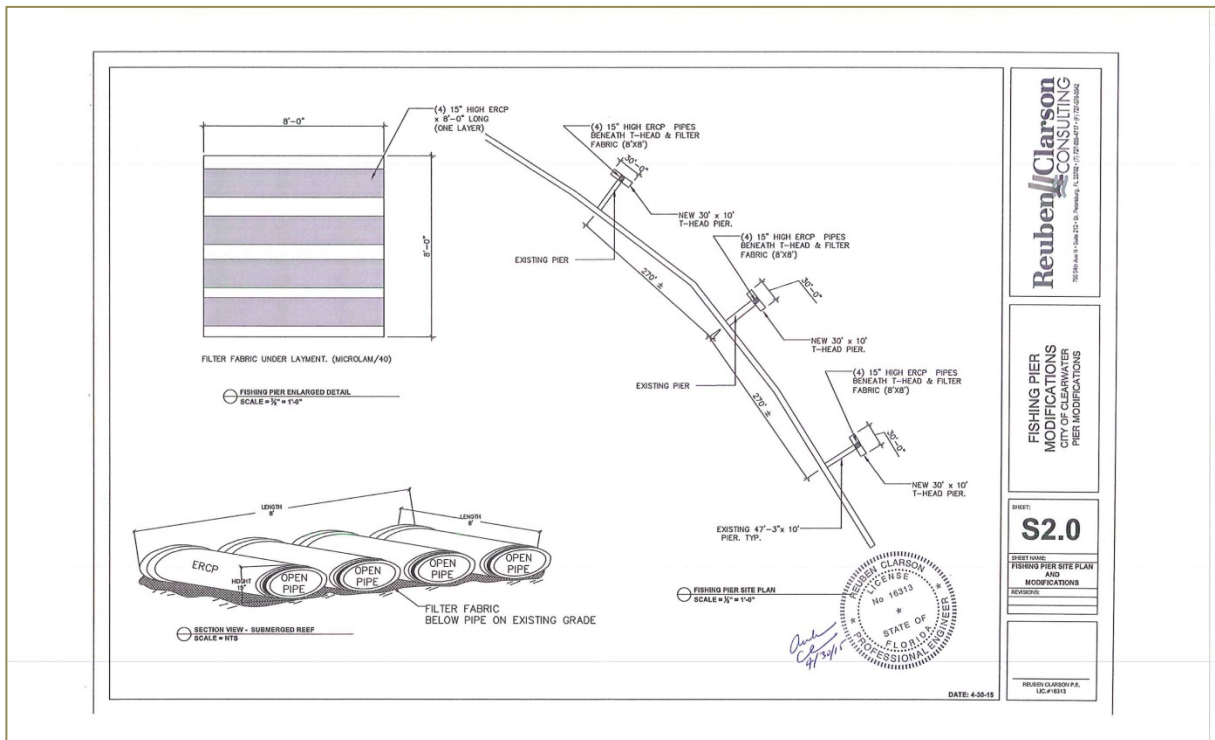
Project drawing showing the 3 piers where T-head extensions will be added and the FAD design which will be added underneath each pier extension (©2016 Reuben Clarson Consulting)
